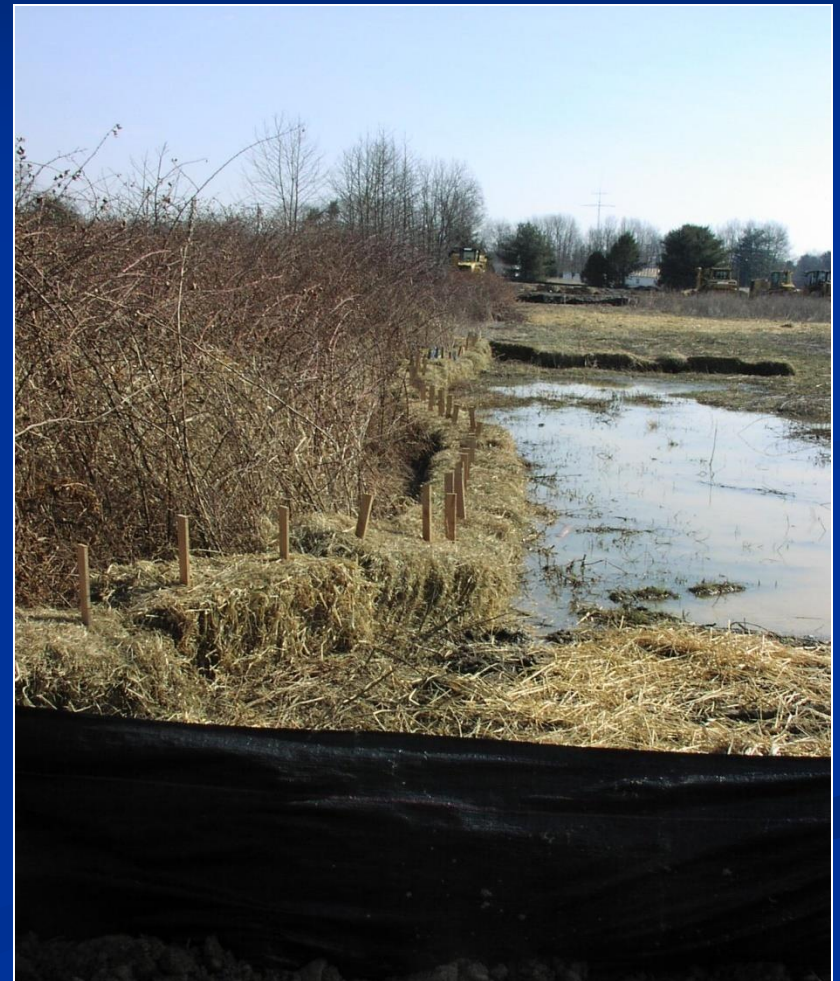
Placement and Anchoring Detail Bale Sediment Barriers
